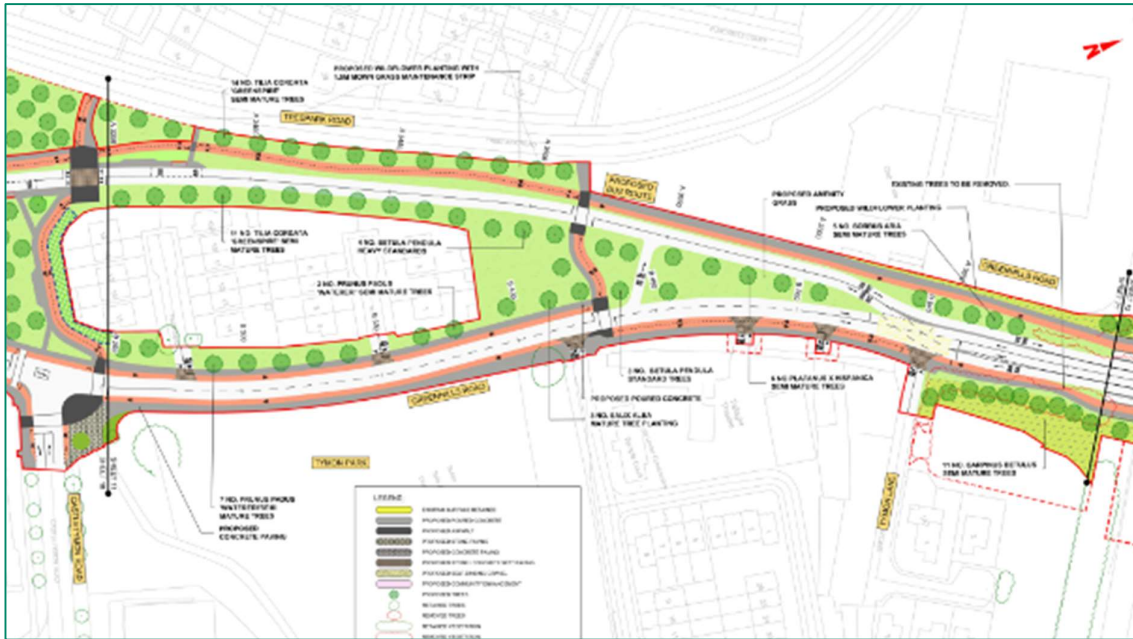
Extract from Landscape General Arrangement Drawing (Sheet 11)
